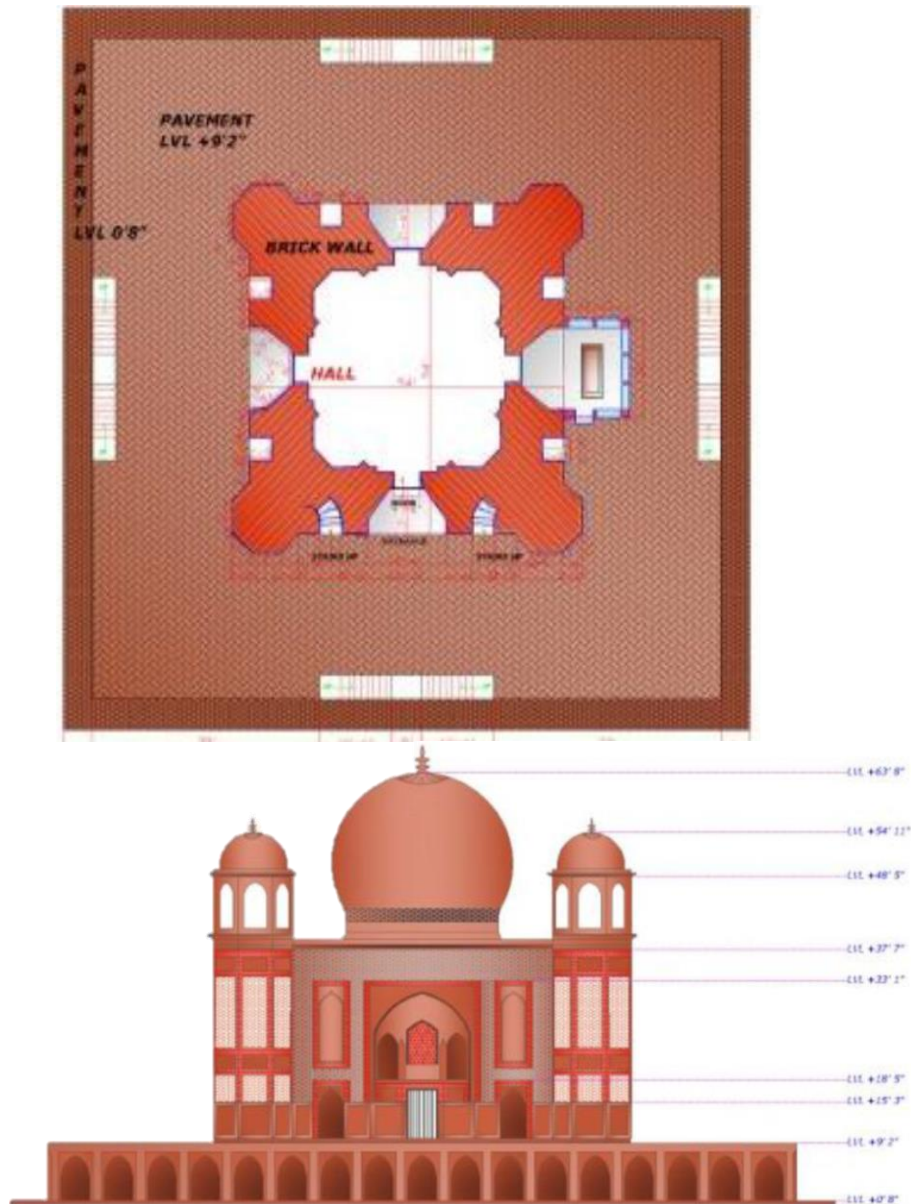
Plan and Elevation of the Tomb of Haji Jamal. Source: Kumar, 2017⁴.
